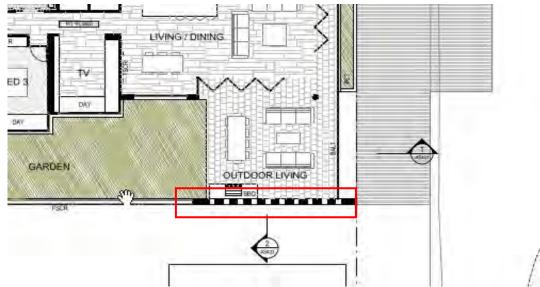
Extract of submitted plans (note: red box indicates location of imperforated brickwork at southern boundary)
